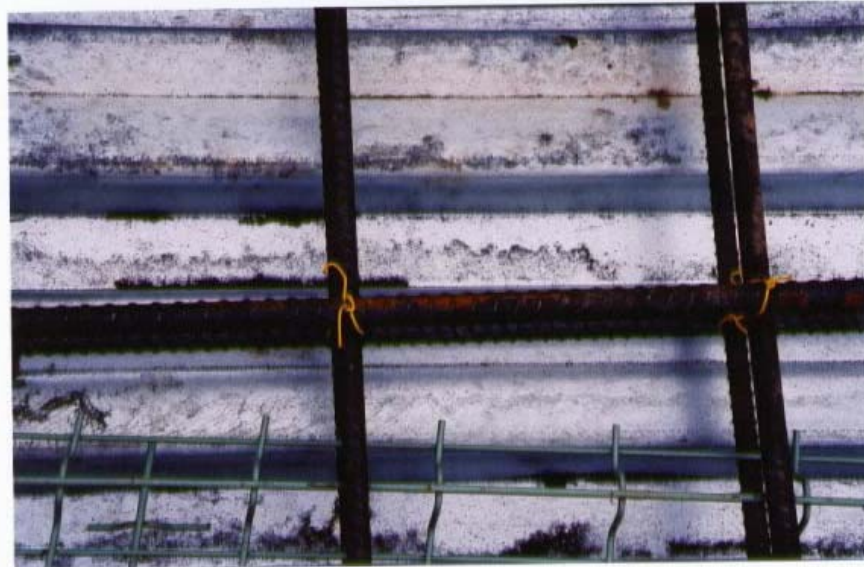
Close-up view of in-place reinforcing steel showing superficial corrosion.
